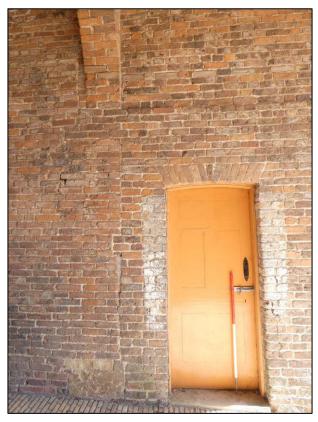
South range, ground floor passage (GF10), doorway to first floor and joint to east wall, looking NE (photo 1/630).
